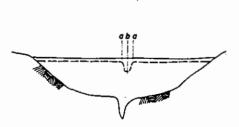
SCHEMATIC ILLUSTRATIONS OF EMBANKMENT DEFORMATIONS
